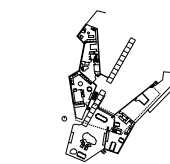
Miller Cottage, an built plan, drawn by Miller, ca. 1950.
